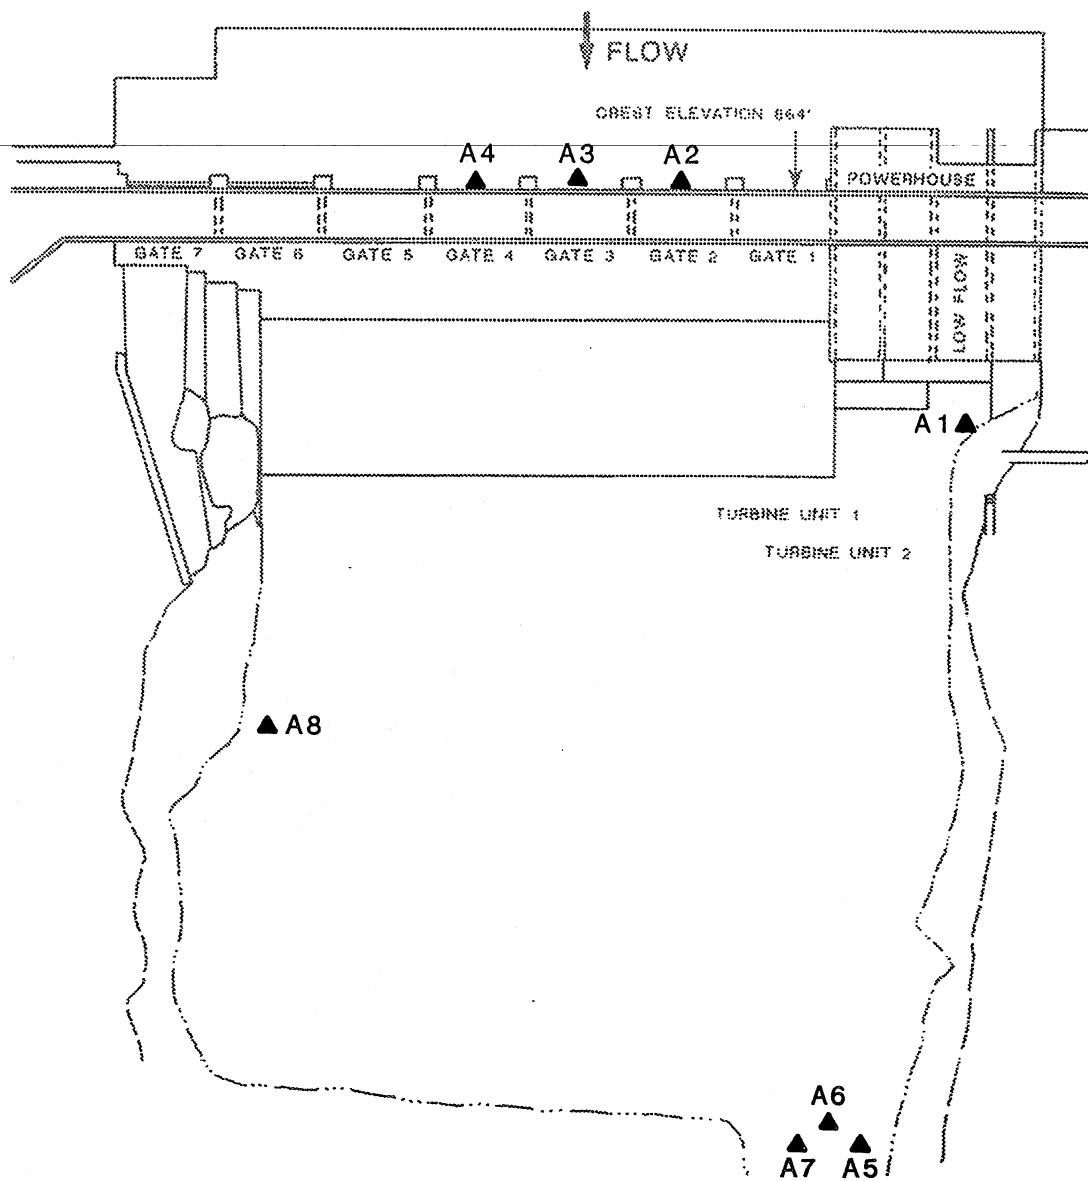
Plan of Rapidan Dam with March 9, 1985, sampling locations.
